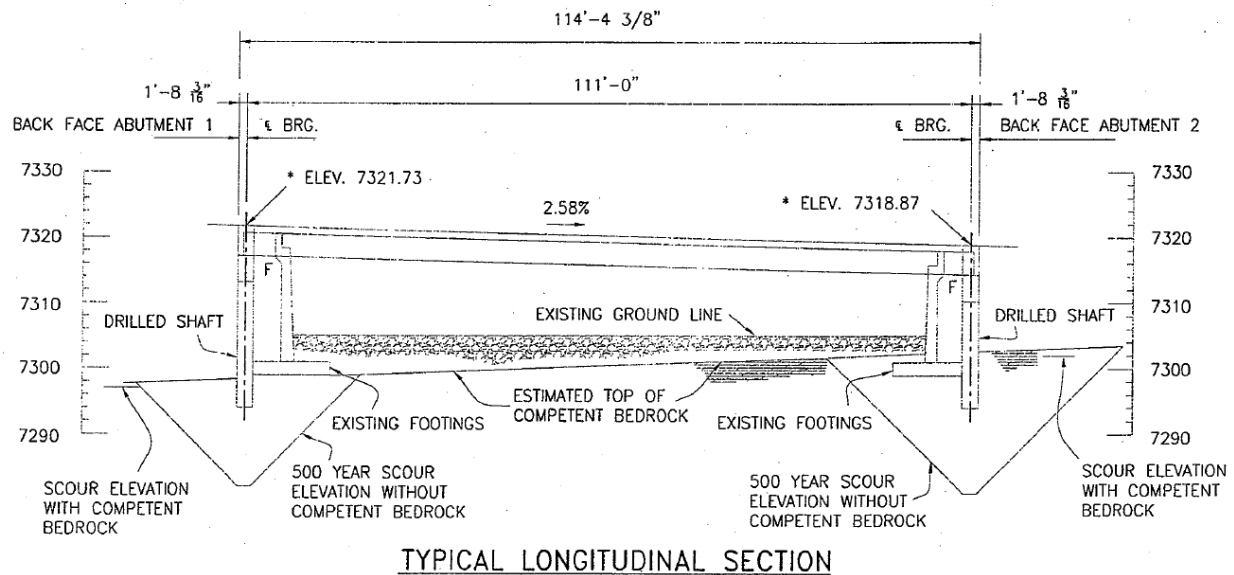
Longitudinal section of C-15-AL (CDOT see Appendix A)
